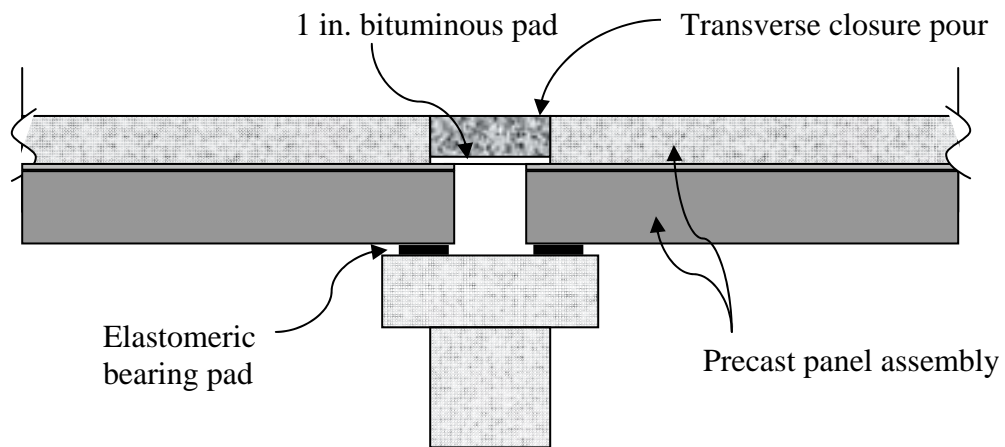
Two interior bridge spans for the proposed jointless bridge
